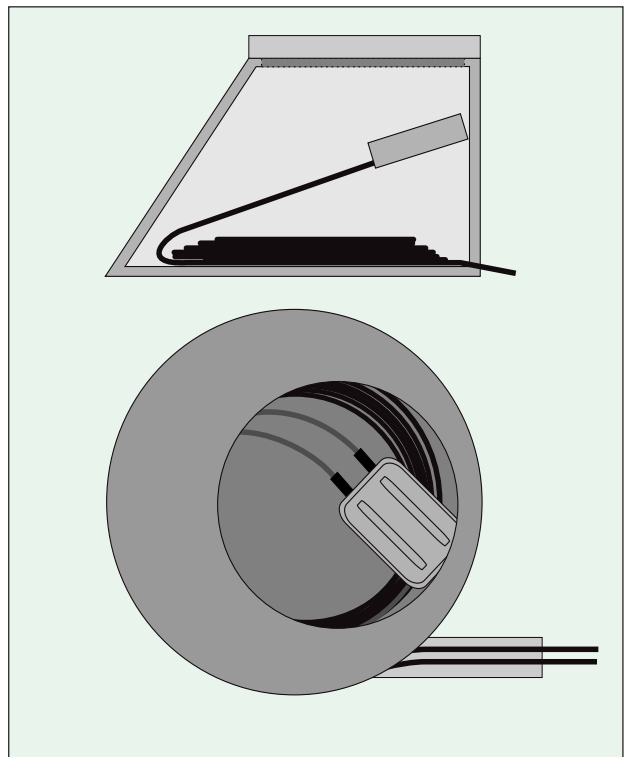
Excess cable is wound up and placed in a concrete ring (outdoor cable).
